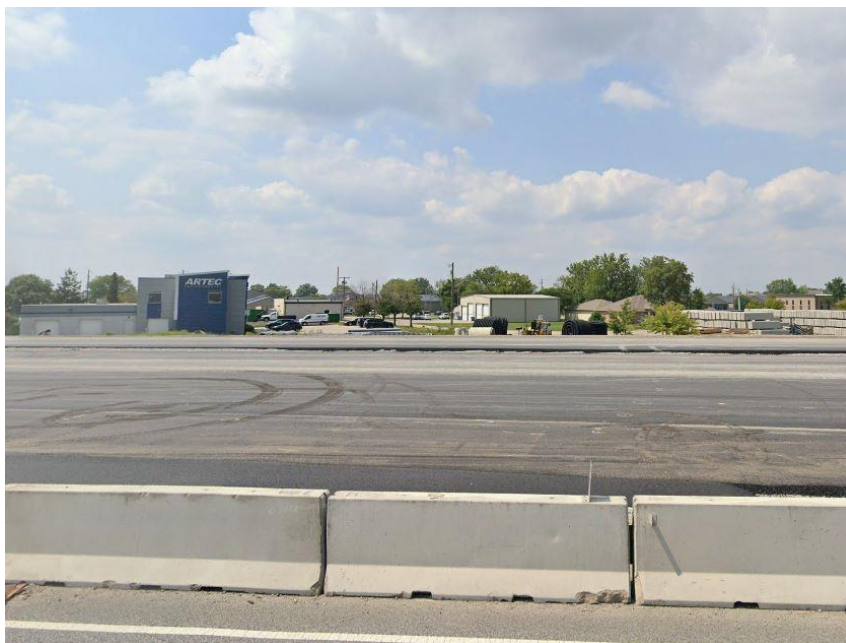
View of Subject Site and Removed Previous Sign from I-465 looking West (August 2023)
